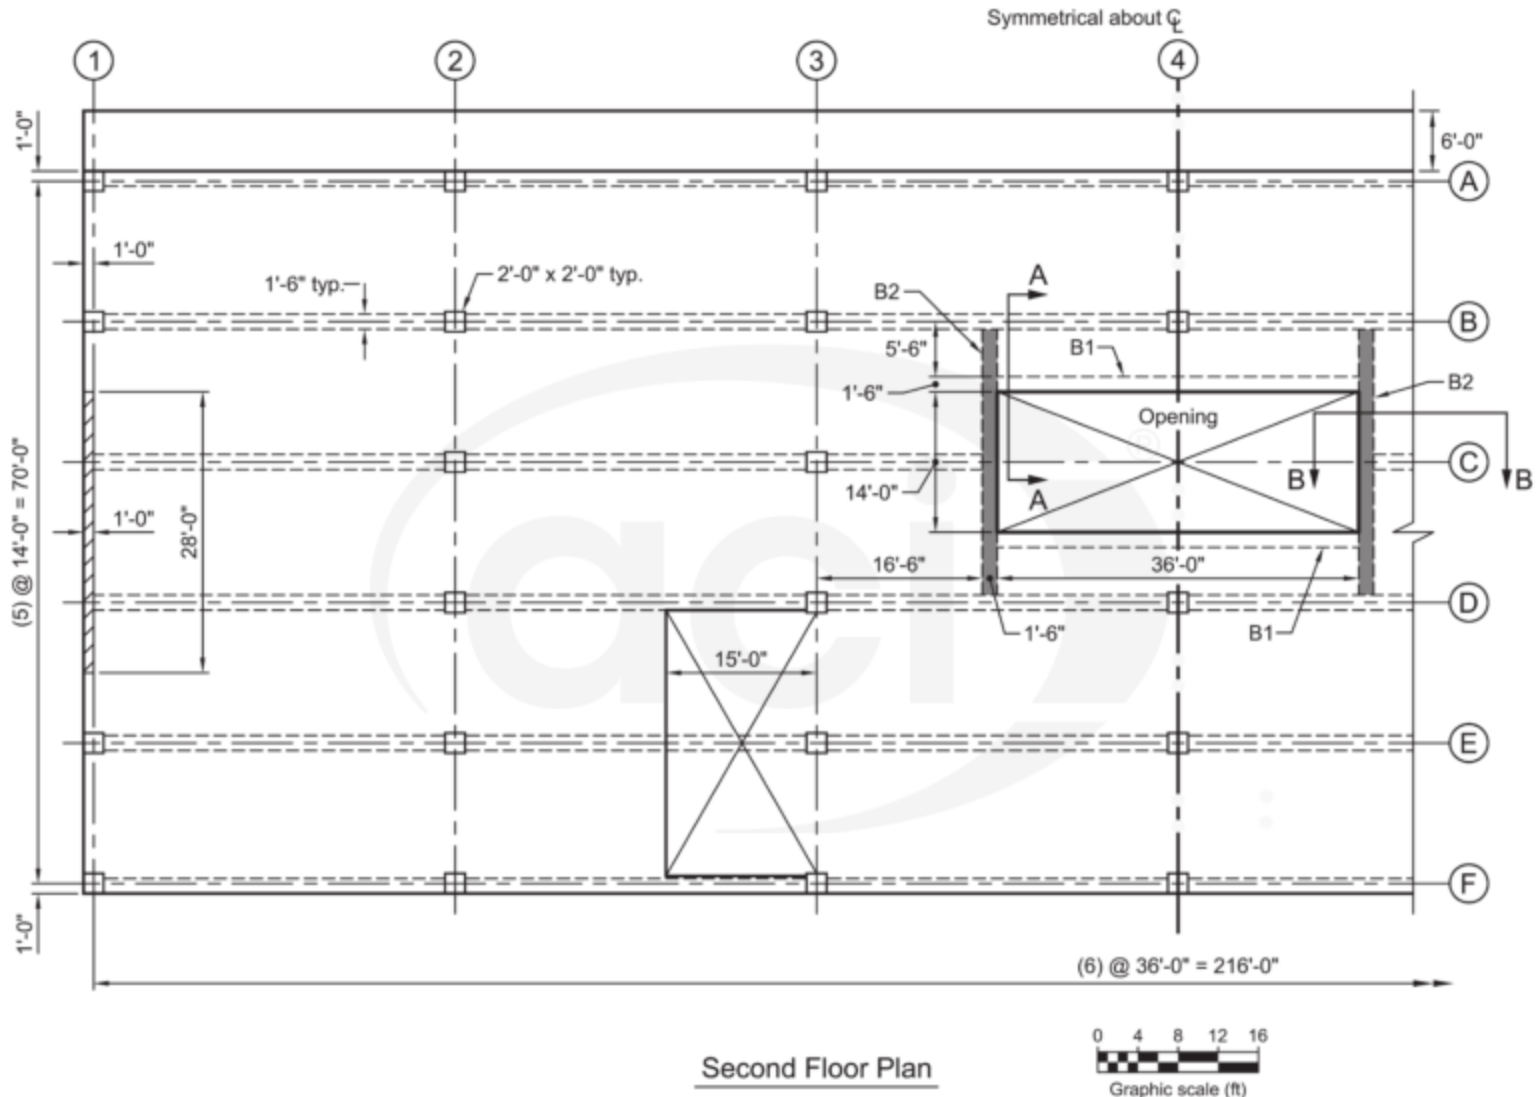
Framing plan showing slab opening and beams framing slab opening.
